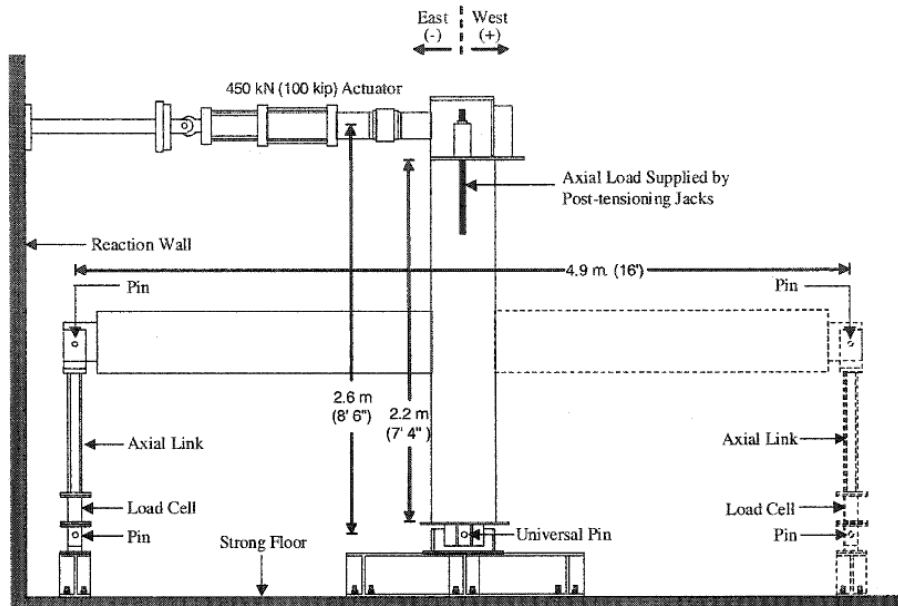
Test Setup - Specimens of Burak and Wight
